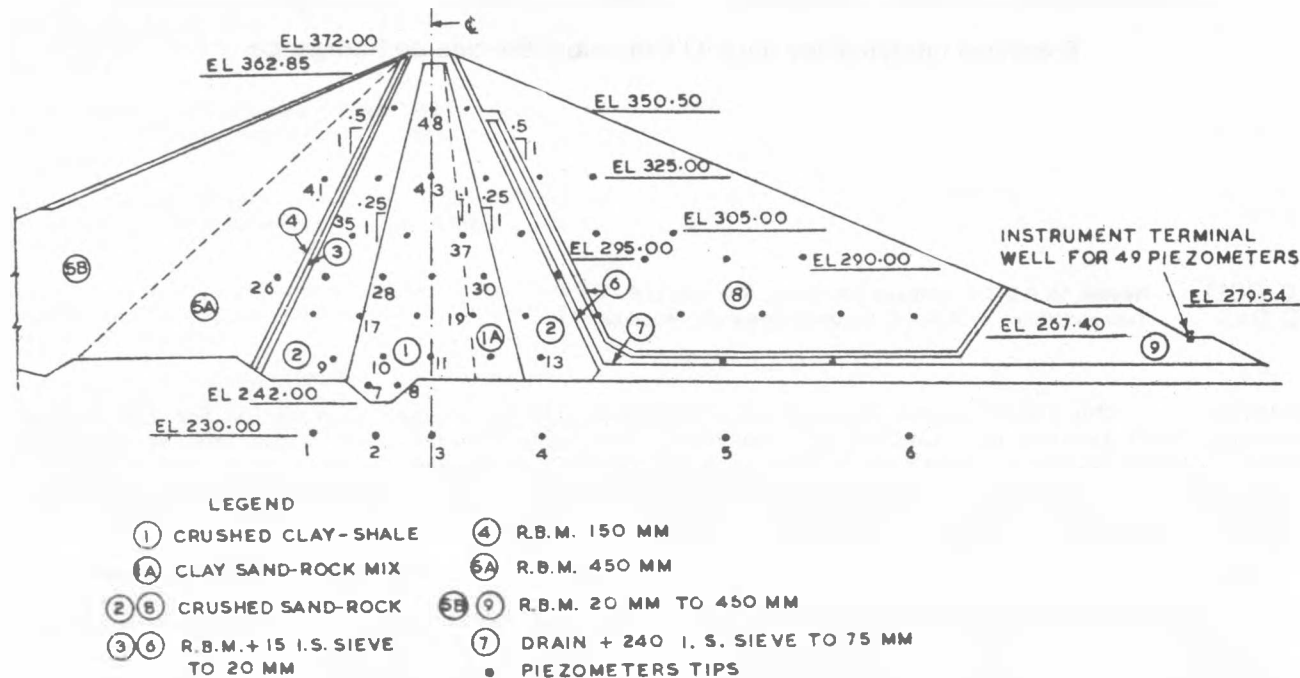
CROSS SECTION OF RAMGANGA DAM SHOWING PIEZOMETER TIPS.
